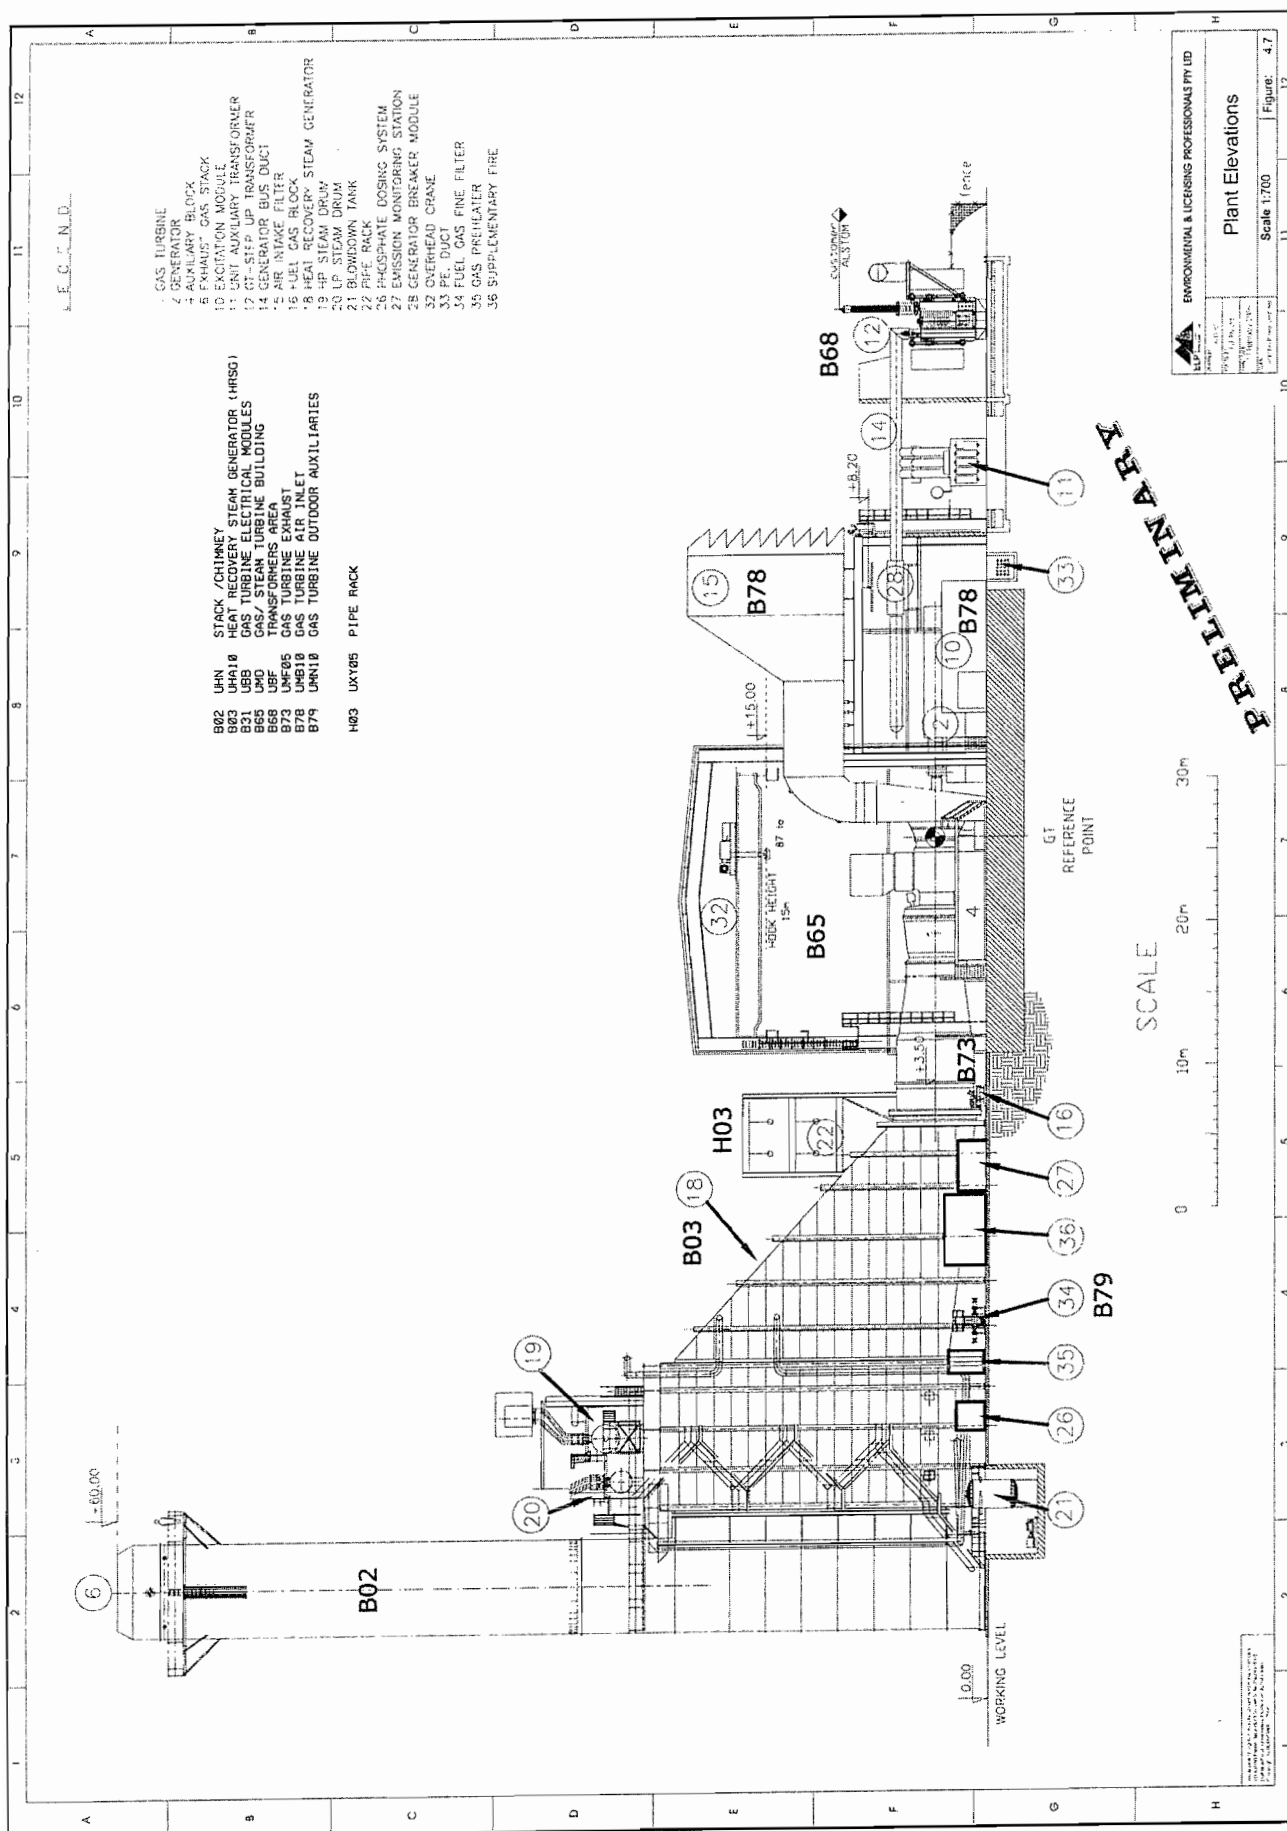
Kwinana Gas-Fired Power Station plant elevations
